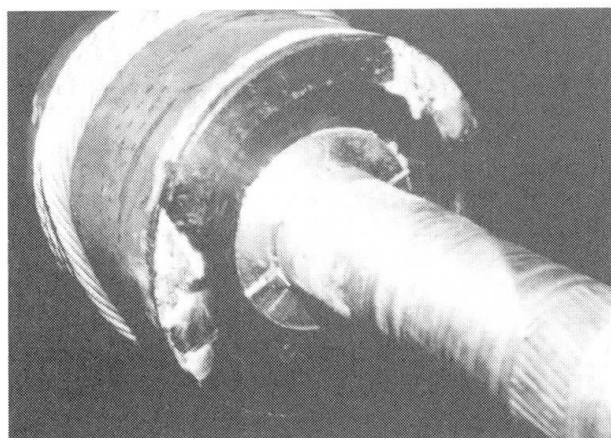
Spiral rope with a wide circular slot between cable and socket to prevent fretting corrosion.
